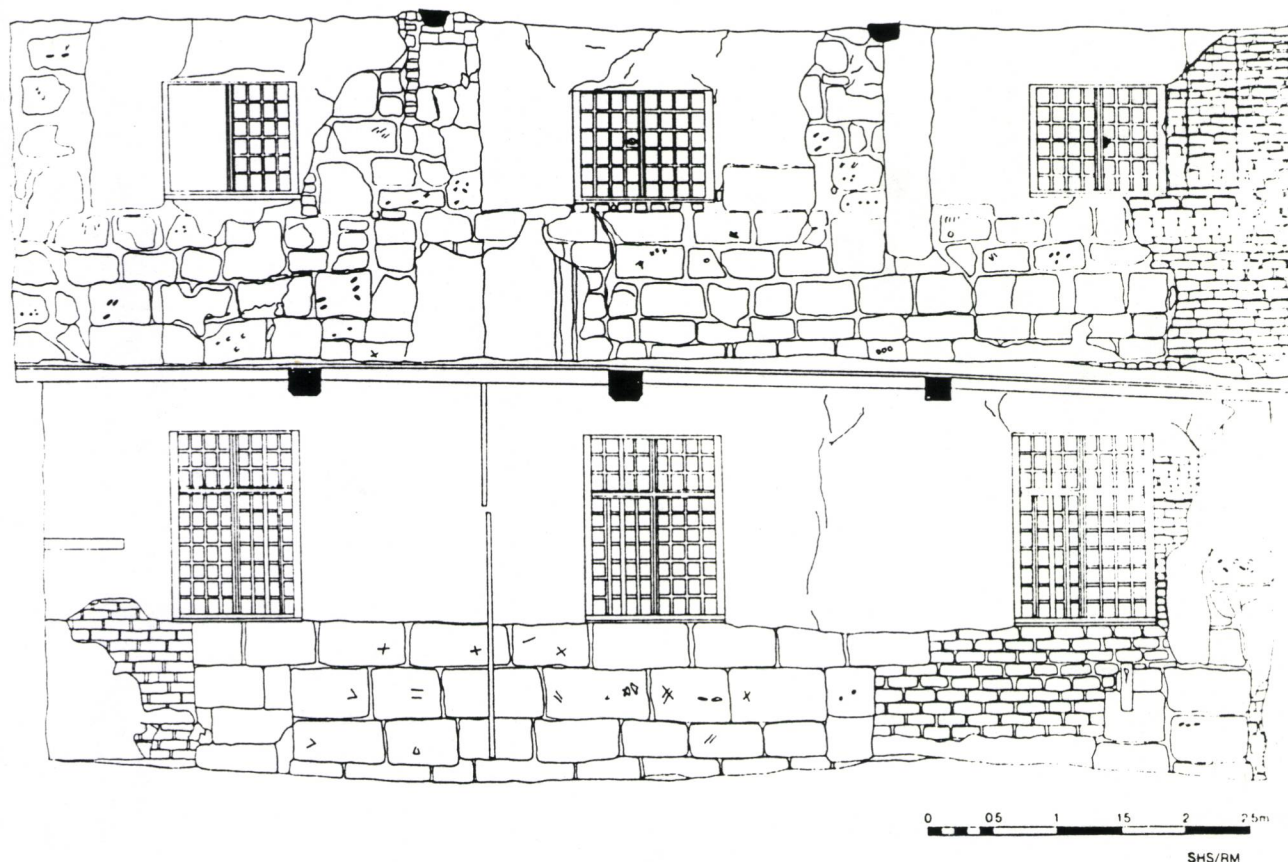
Lichfield, Muniment Rooms: internal elevation of south wall
